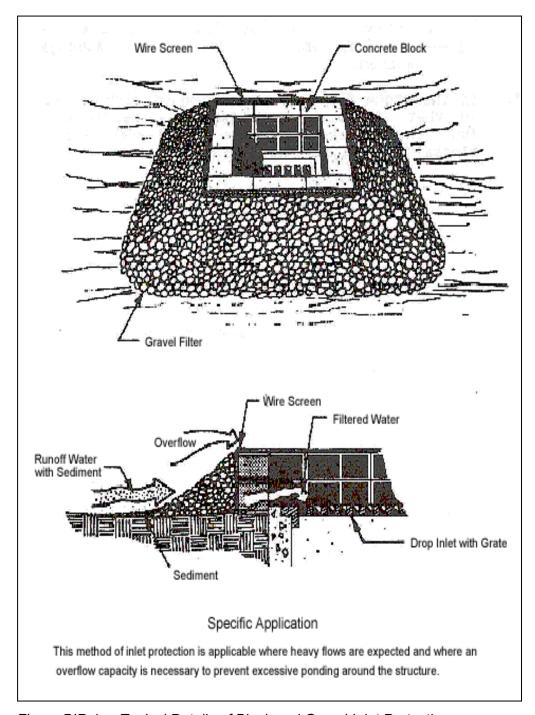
Typical Details of Block and Gravel Inlet Protection
